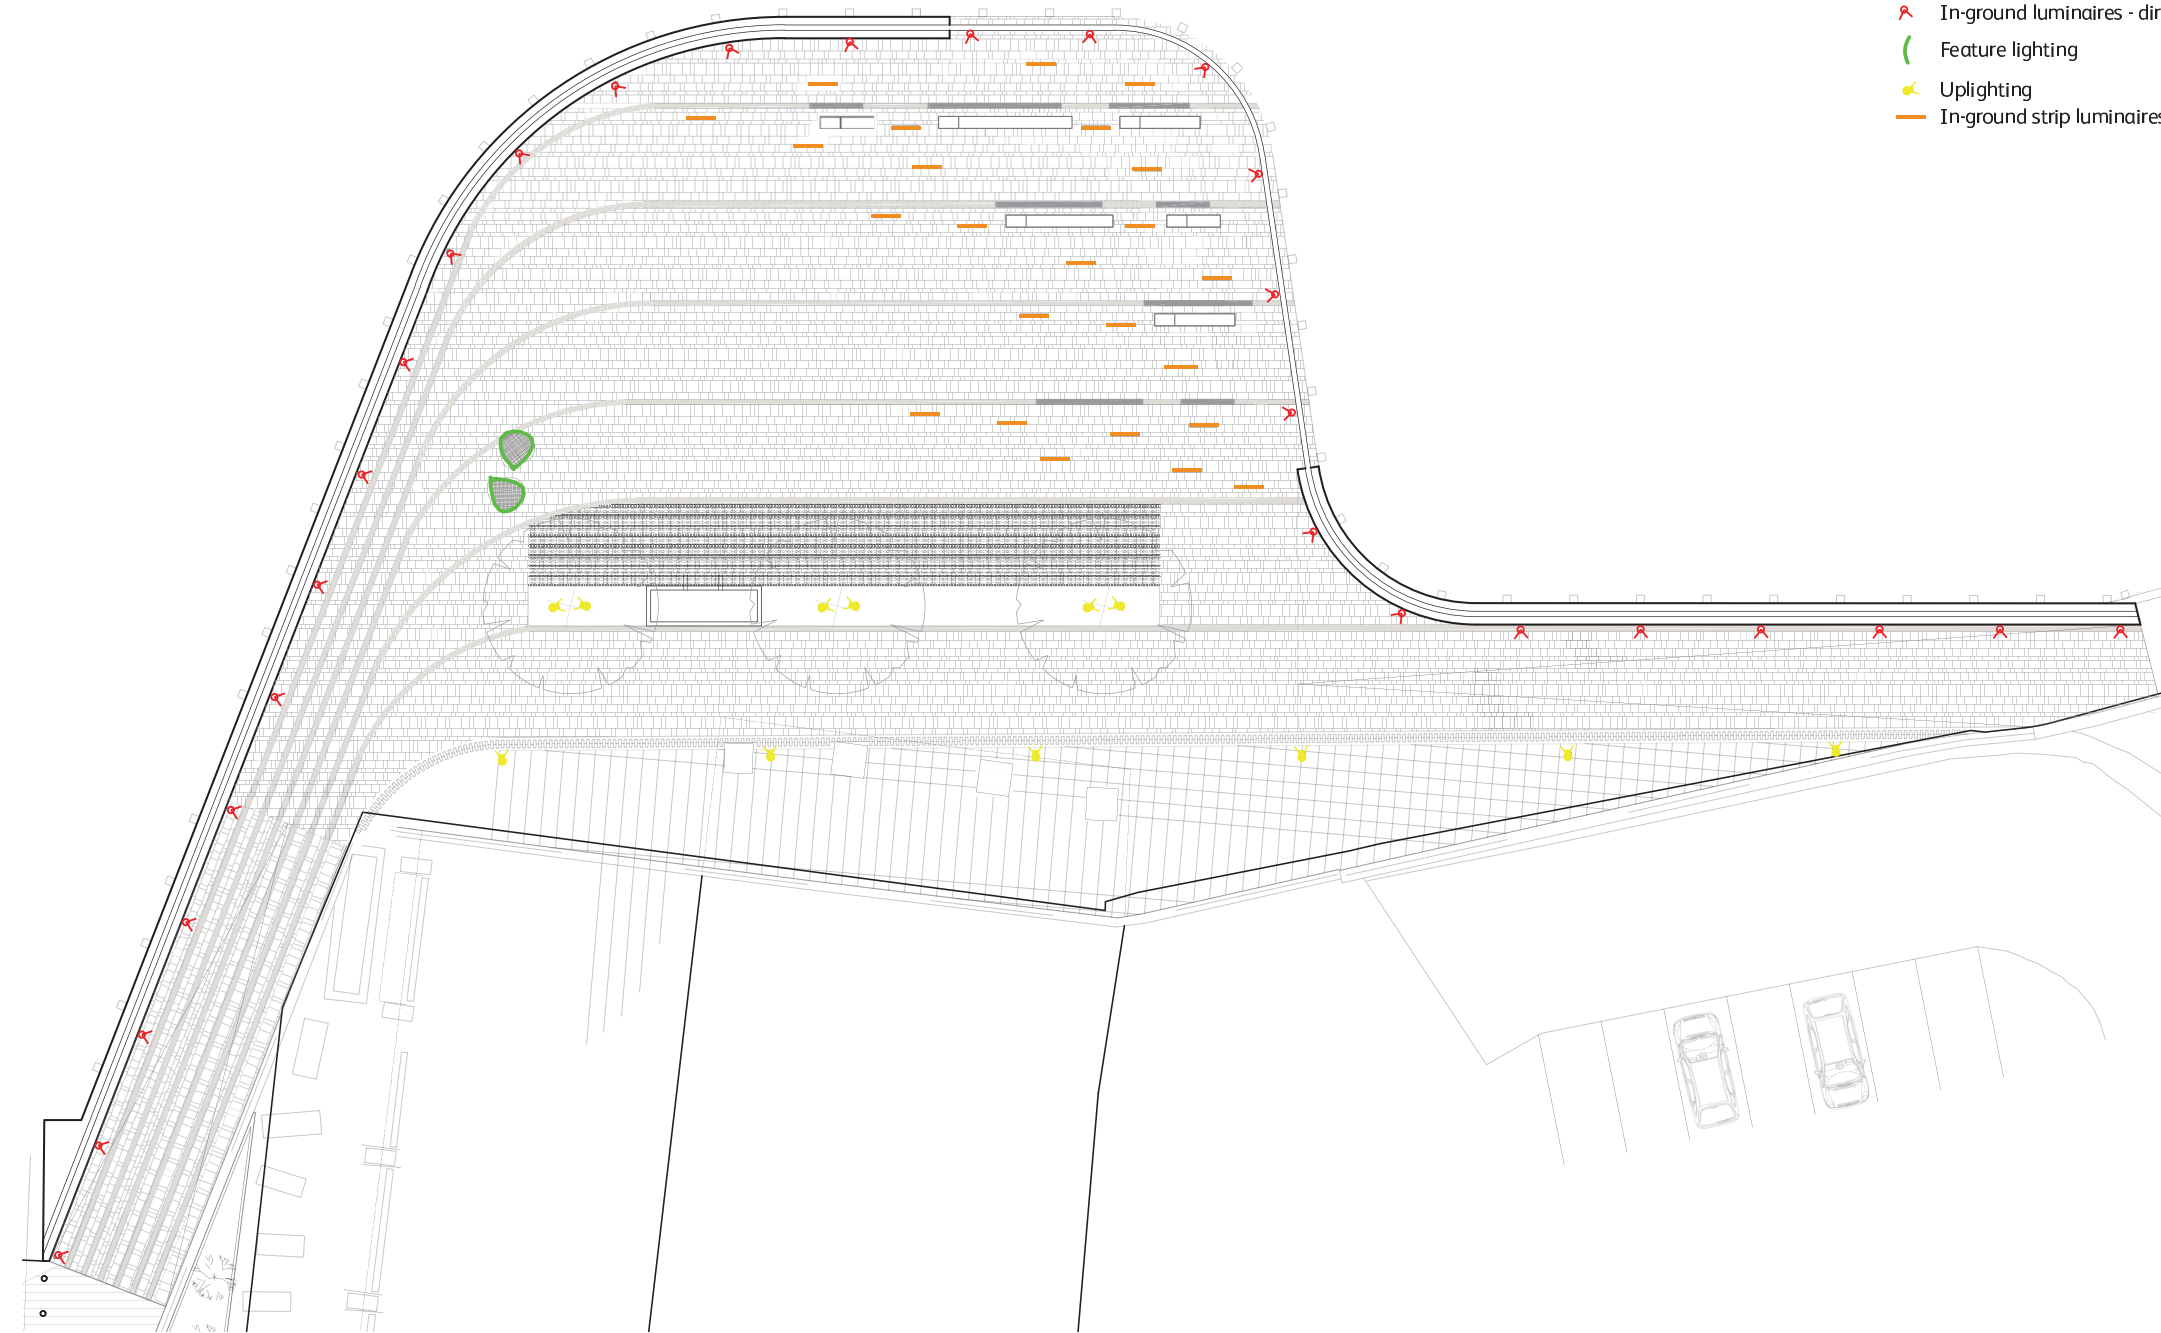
Proposed lighting plan for the drop shaft structure (not to scale)
